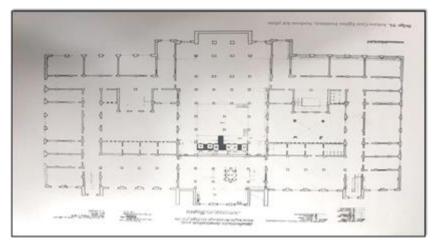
Gazi Education Institute, Basement Floor Plan, (Yavuz, Y, Empire to Republic Architect Kemalettin 1870-1927, Source: GEEA)
